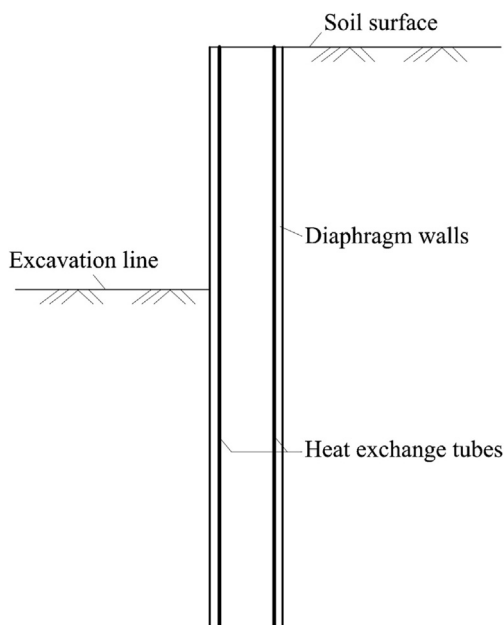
Section plan drawing of geothermal heat exchangers embedded in diaphragm walls (Sun et al., 2013).
